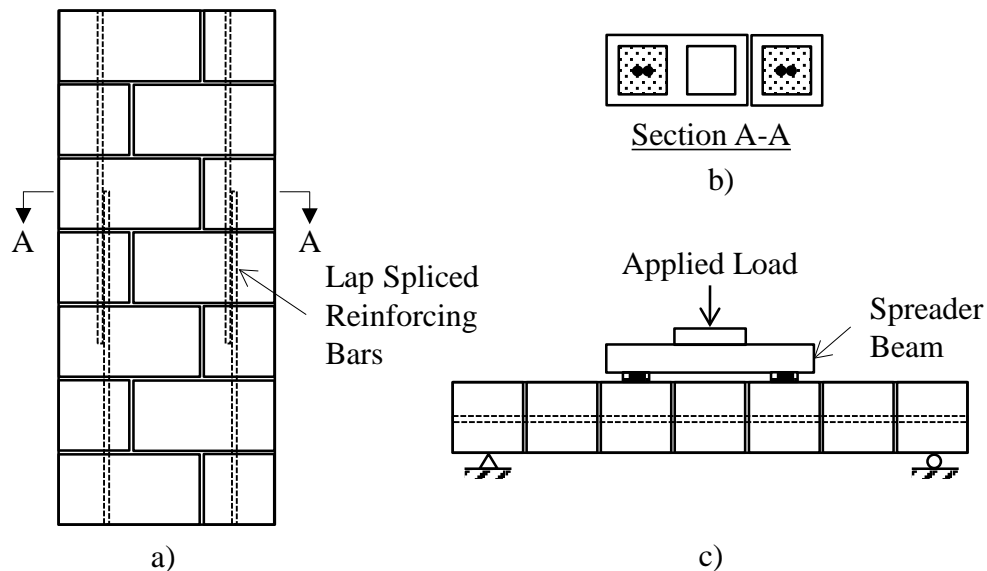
Lap splices in wall specimens as tested by Ahmadi – Modified from Ahmadi (2001): a) elevation, b) cross section, and c) test setup.
